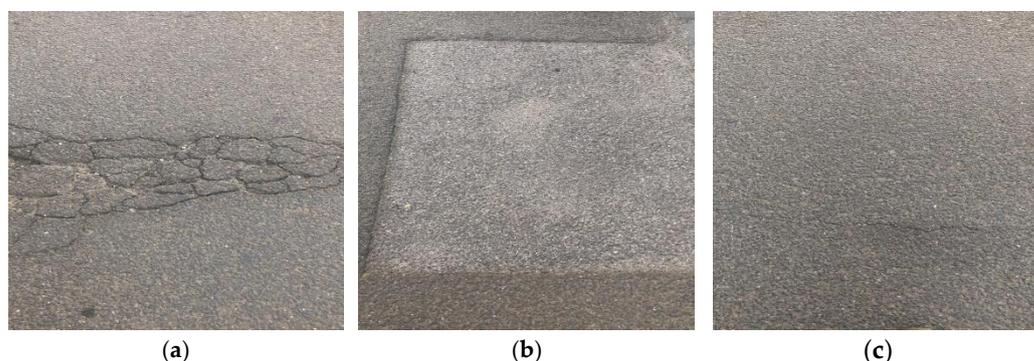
The inspected pavement distresses: (a) alligator cracks, (b) patches, and (c) longitudinal cracks.
